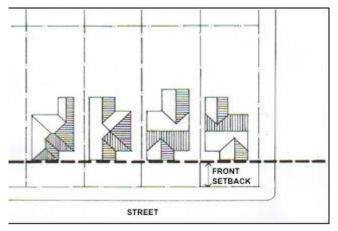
50% of the front elevation must be built to the predominant building line
